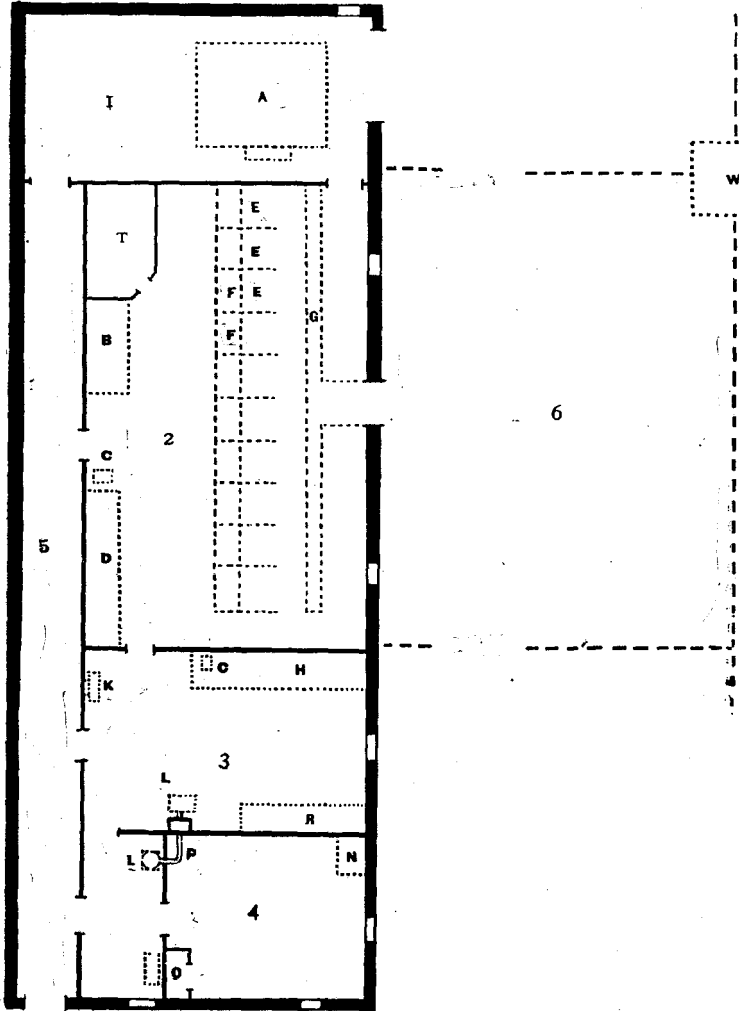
Ground Plan of Feeding Stable and adjacent Rooms.
